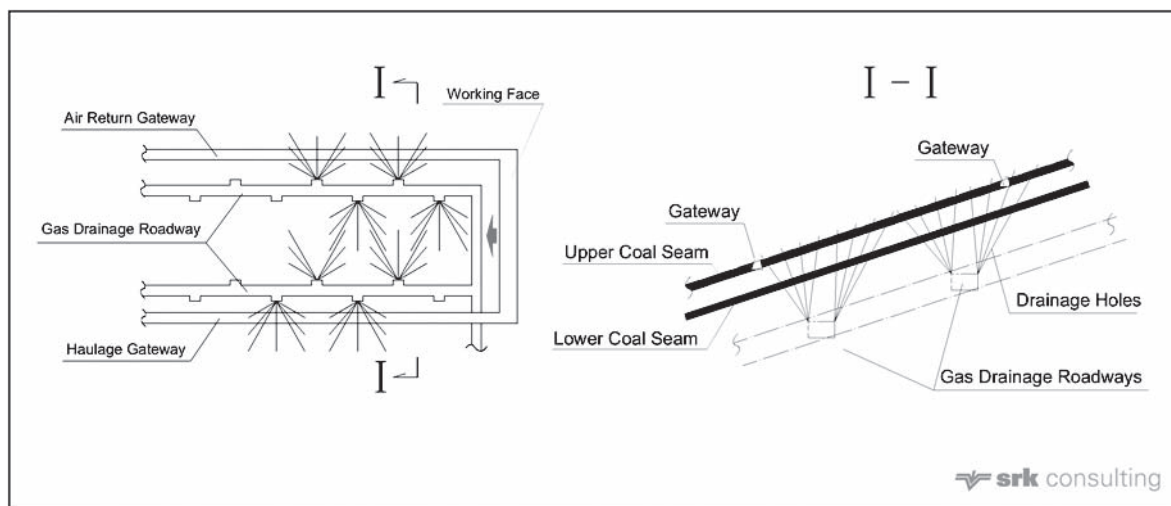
Schematic of Underground Coal Seam Gas Drainage System in Lasu
